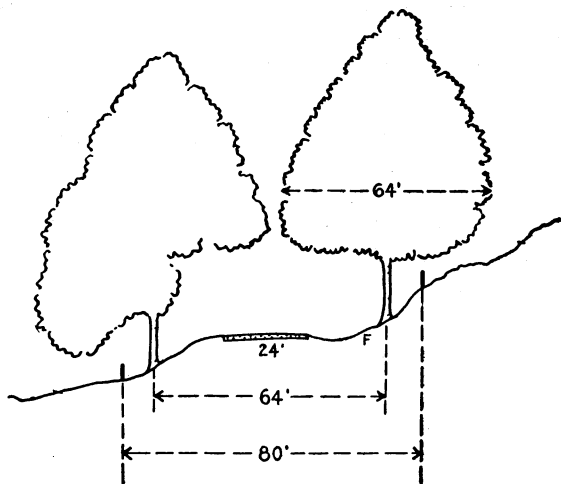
An 80-foot right of way with a 24-foot improved section and the trees placed 32 feet from the center line, with the footpath (F) placed inside the trees
